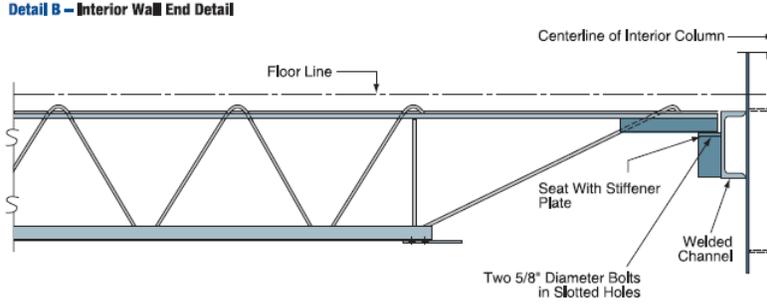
Details of floor truss members and end connections (from FEMA 403).
